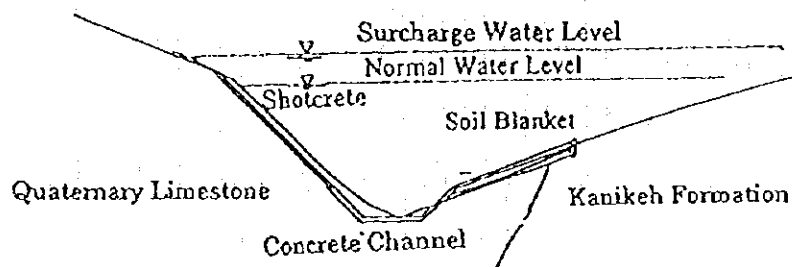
Typical Cross Section of Reservoir Protection
